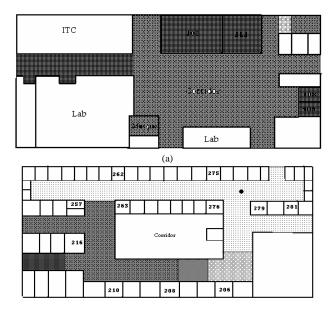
Building Layout with the access point located in the second floor. (a) First floor, (b) Second floor.
